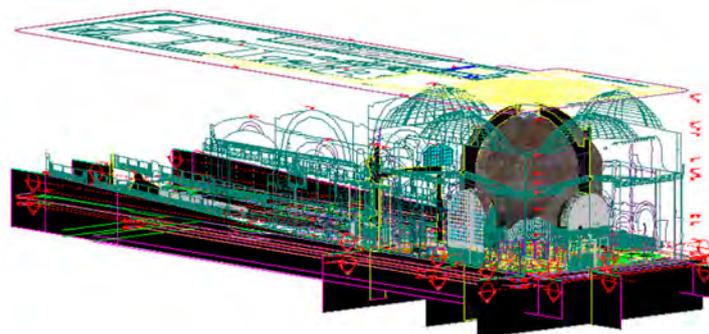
Import of plans, sections, elevations and the point cloud into Revit 2019.
